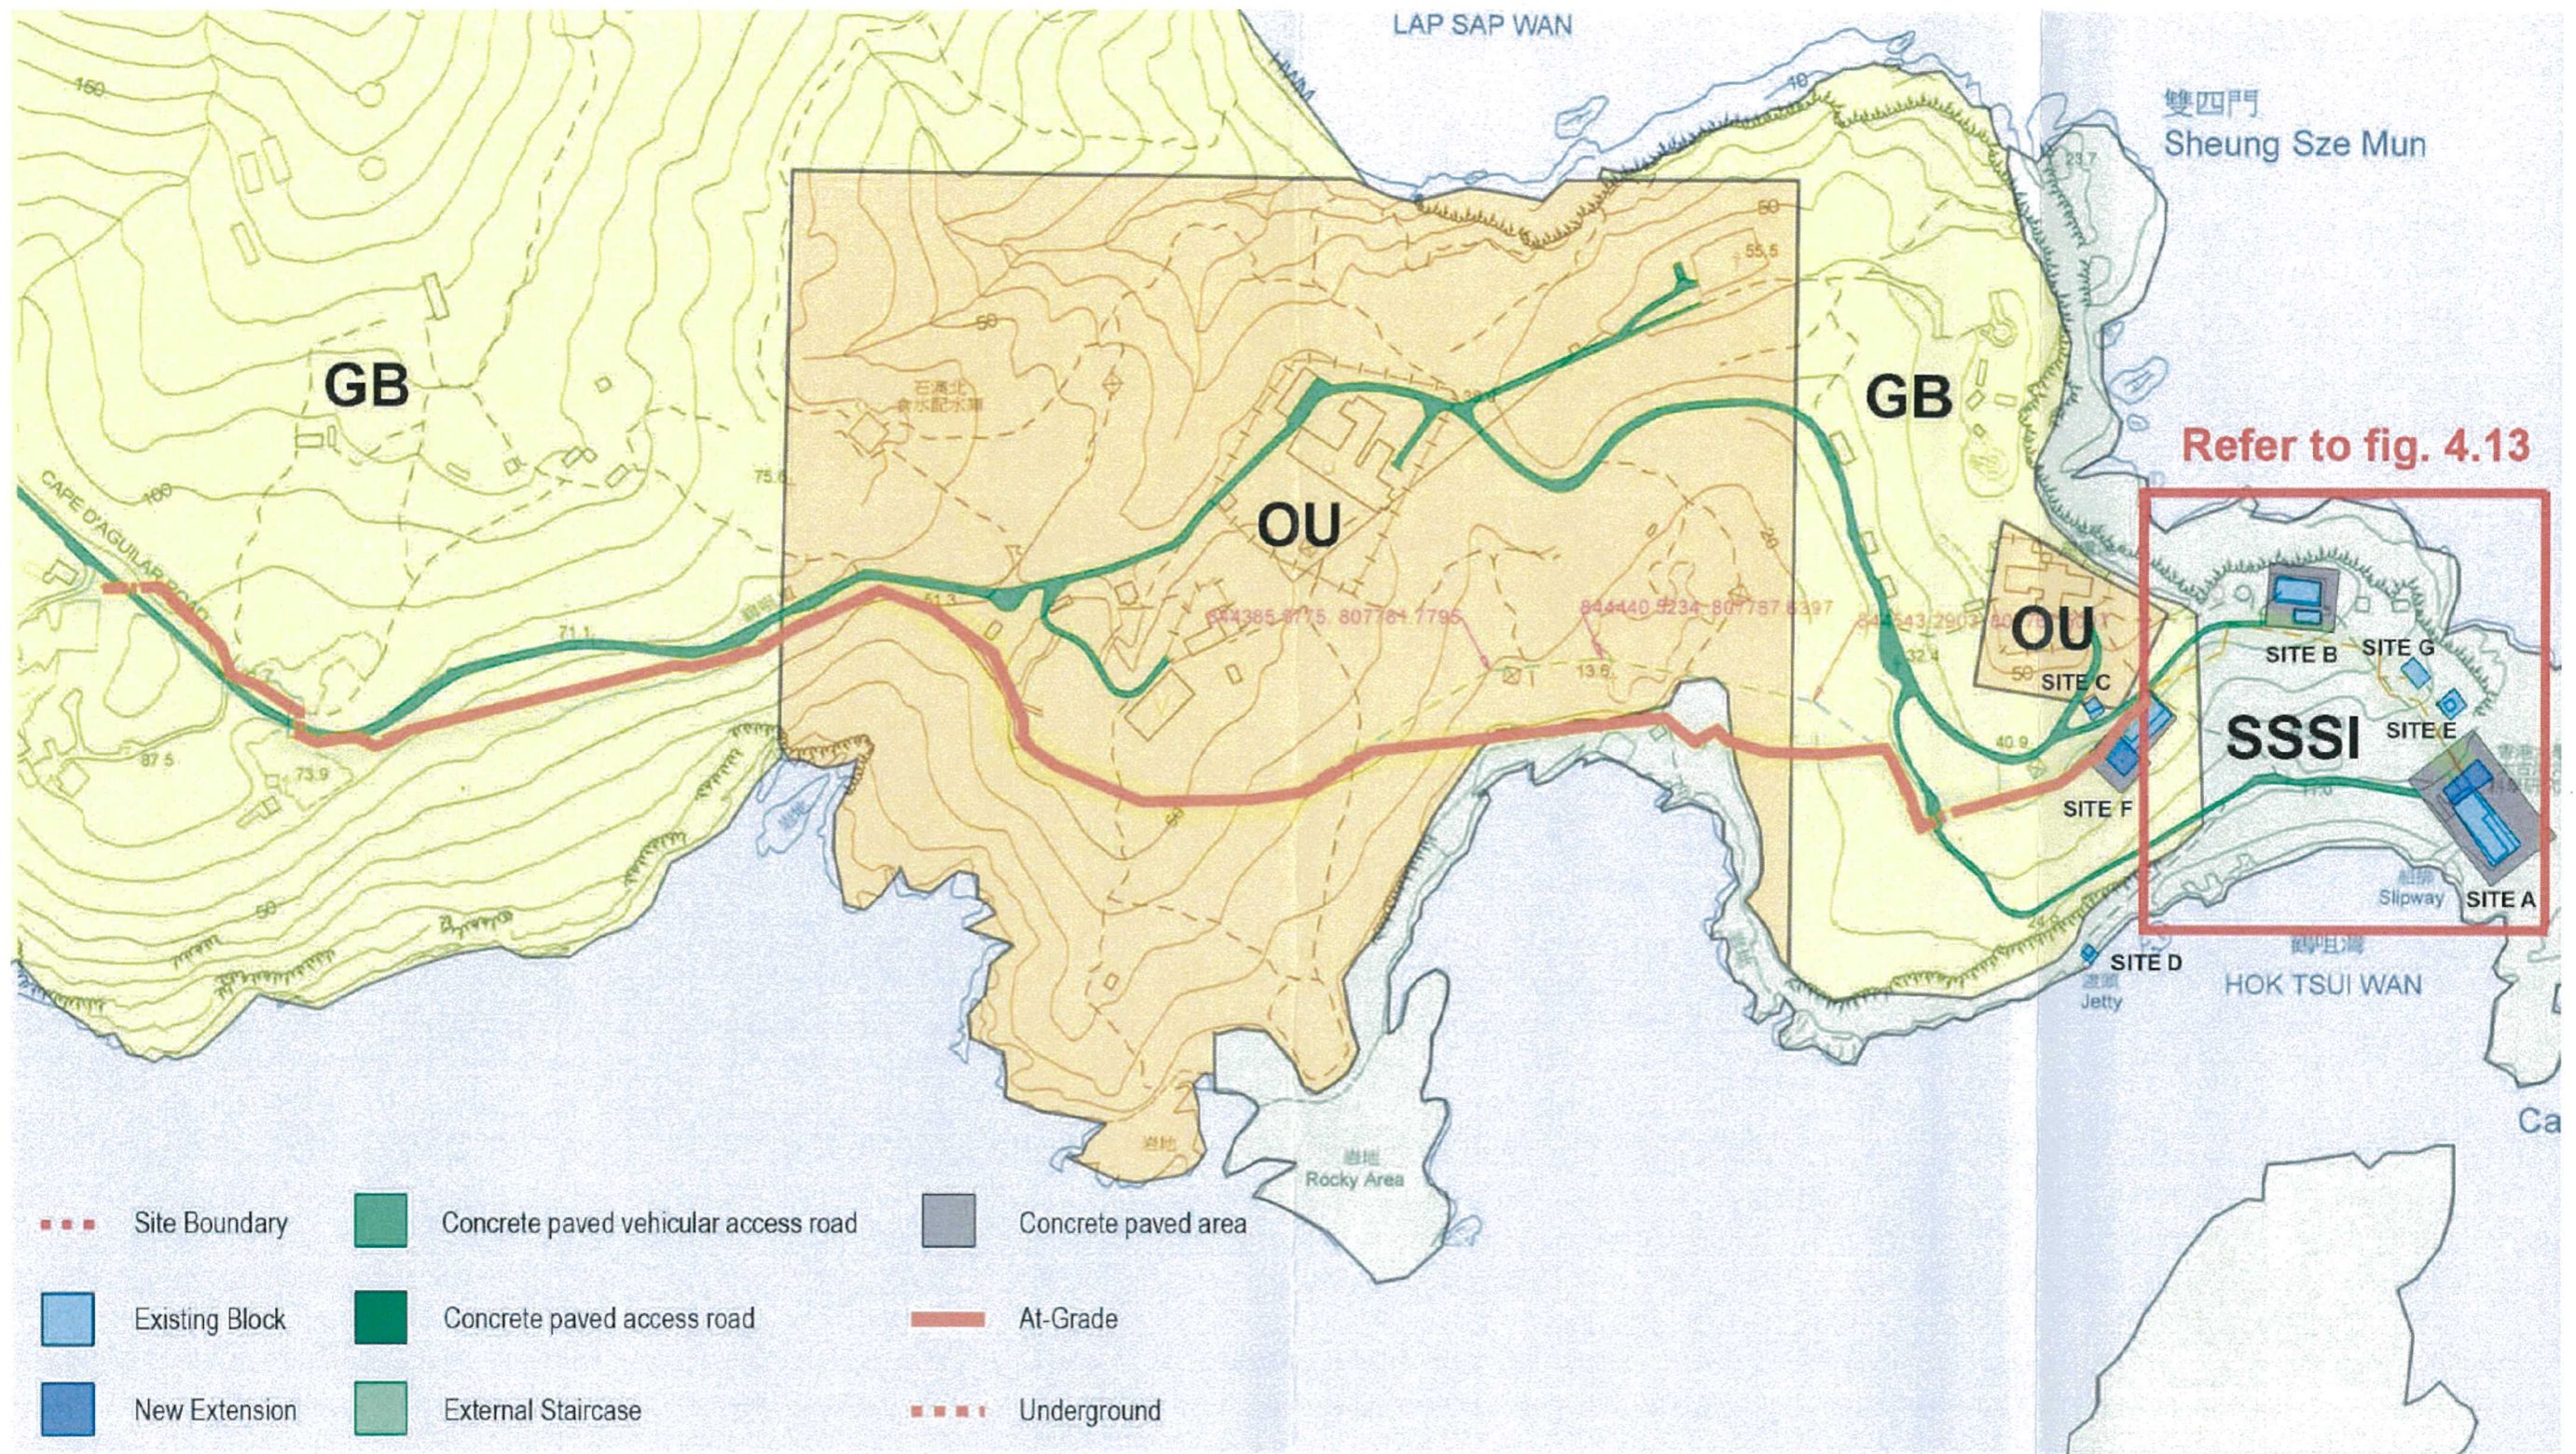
Layout Plan Describing the Proposed At-grade and Underneath Concrete Paved Area Arrangement of Fire Services Water Pipe with Alignment
